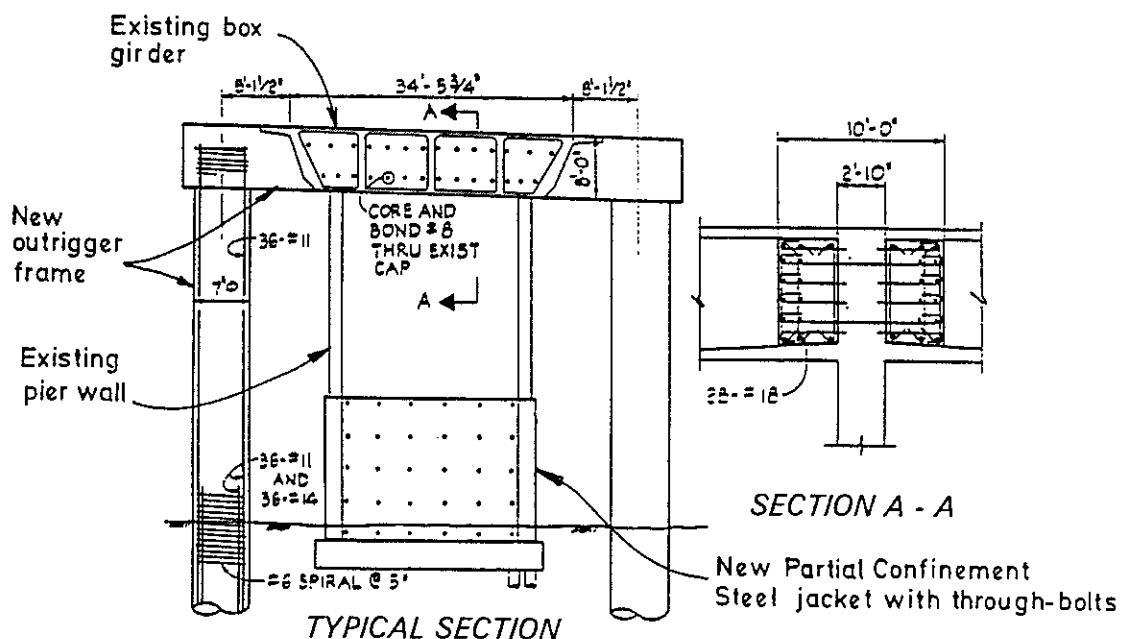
Retrofit of a wall-type pier using a new outrigger frame and a partial confinement steel jacket made by Caltrans in 1988 (Priestley et al. 1992a).
